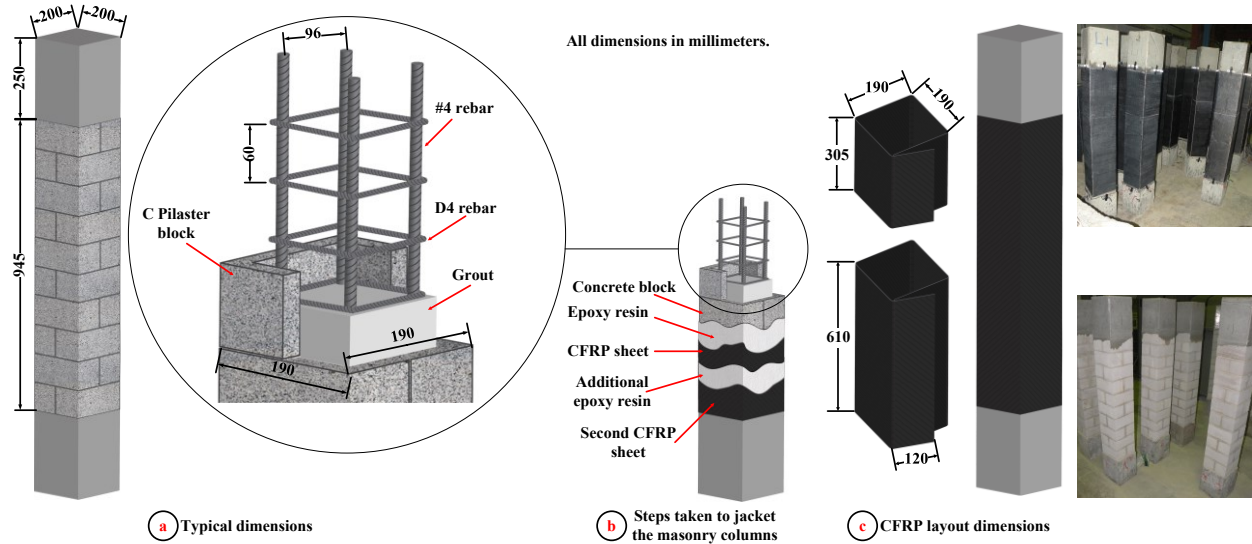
Typical dimensions and construction details of reinforced masonry column.
